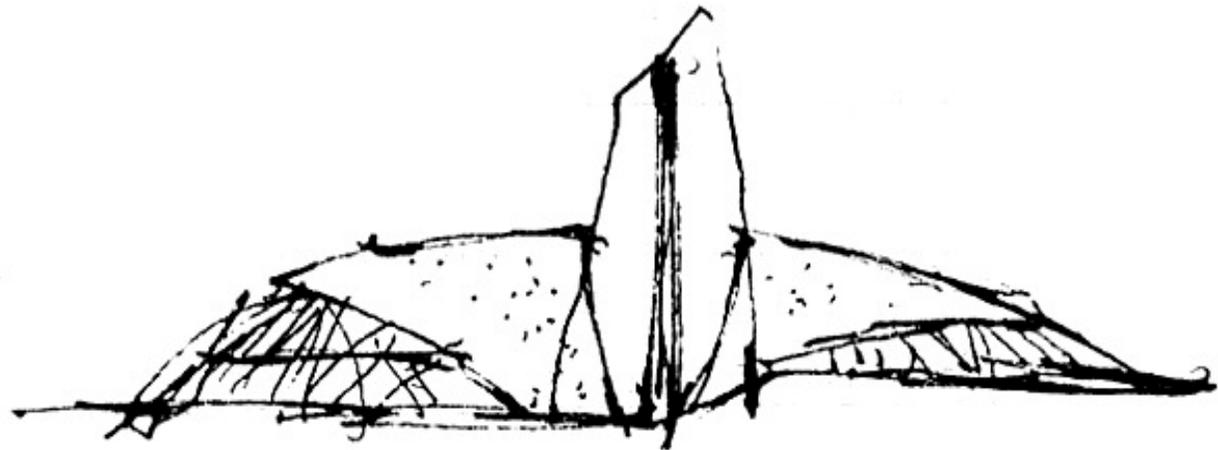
Sketch elevation of how the building might look. The main entrance is located at the foot of the central tower giving access to both lower and upper floor of both wings. Breaks in the external fabric of the shell allow views out of the building at key points.
